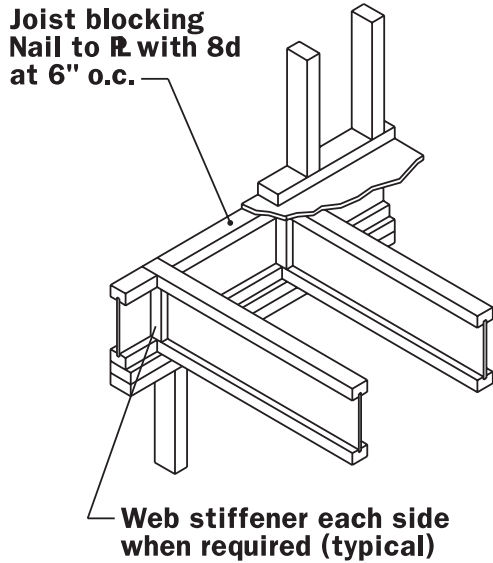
I-Joist Bearing on Wall With Rim Joist as End Restraint
